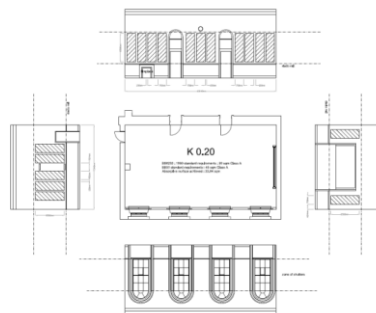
Installation of Acoustic Panels in Room K0.20, used with permission from King's College London
